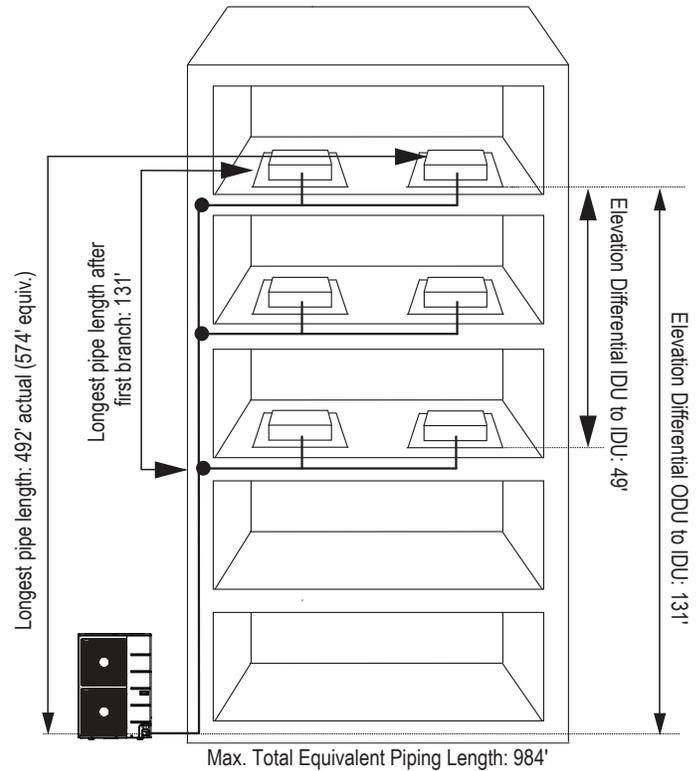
Typical Multi V S Three-Phase Heat Pump System Building Layout Listing the Piping Limitations — When the Outdoor Unit is Below the Indoor Units.
